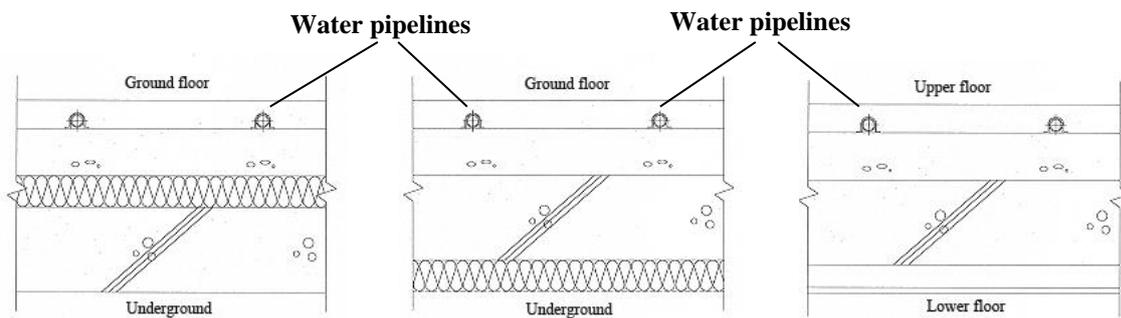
Sections of underfloor heating applied in apartment buildings (Song, 1994)
